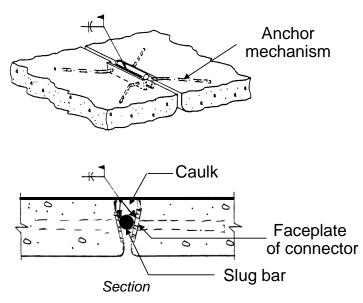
Sketch of flange-to-flange connection with sloping faceplates to hold the slug bar
